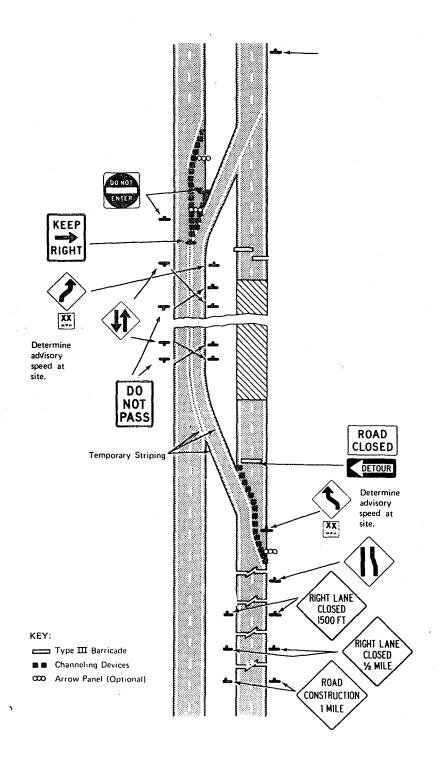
Typical Application of Crossover Control. (Source: MUTCD, 1978, page 6B-10)
